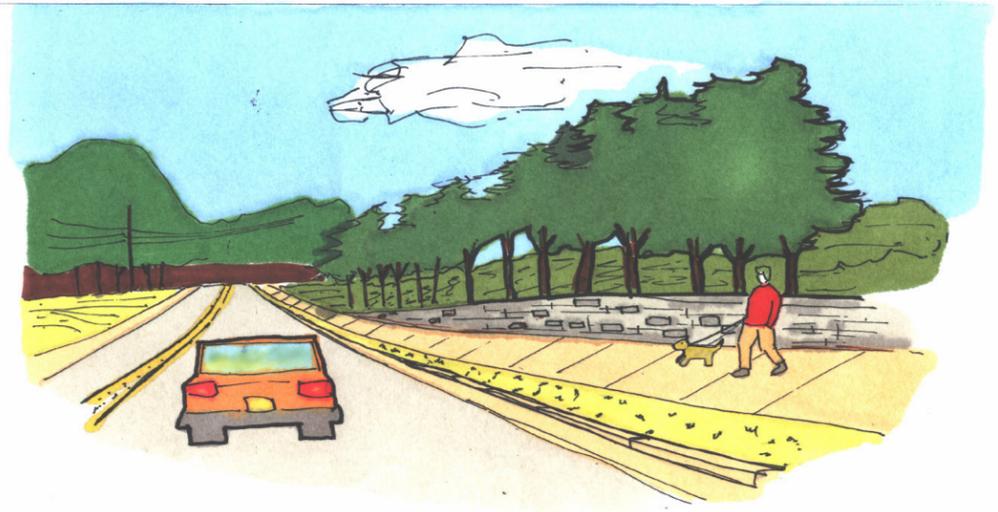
Sketch of Proposed Conditions along Bentley Road (southbound)
